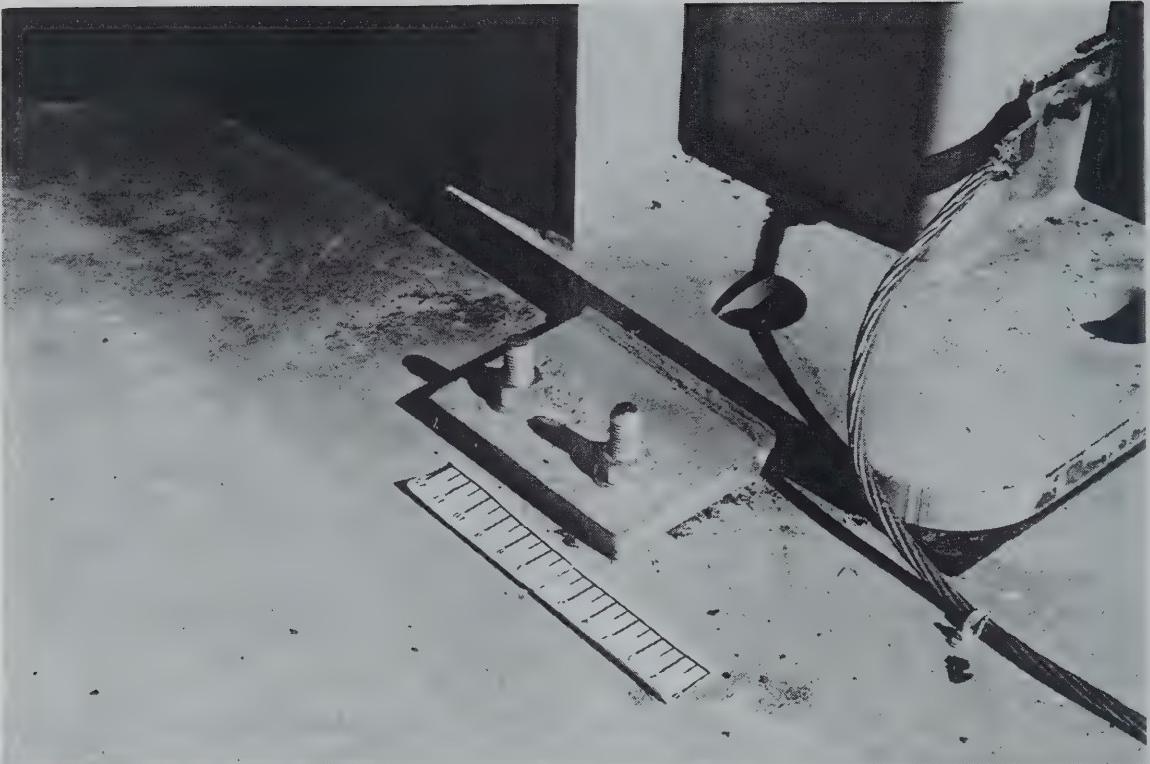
A plate was welded to a mounting flange on the transformer and then bolted to the foundation slab.
